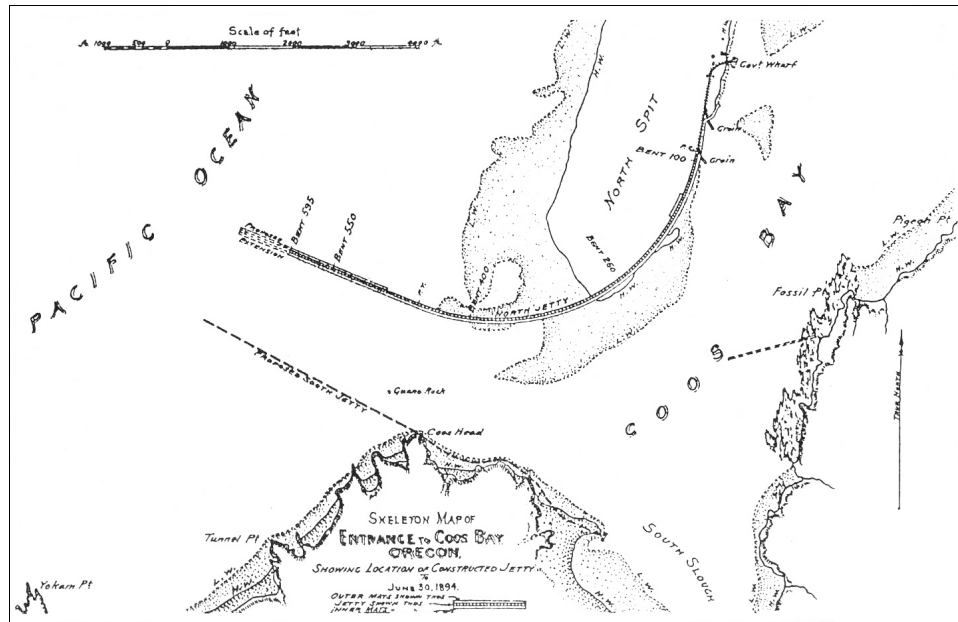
North Jetty to Bent No. 595 and North Spit, June, 1894 (U.S. Army Corps of Engineers 1894[2](4):Section UU3).
